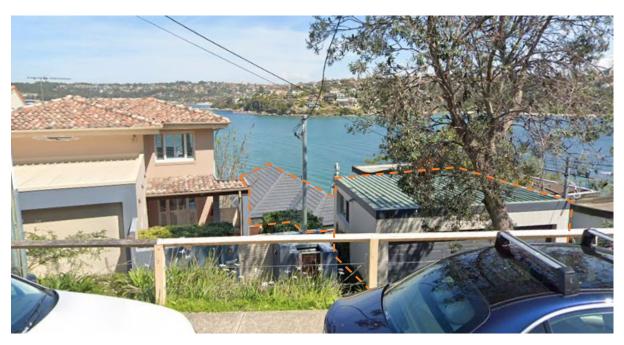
View overlooking subject site from Cutler Road. It is considered that the views are retained for adjoining properties as the proposed roof will be lower in height to the existing. (Google Maps, 2018)
